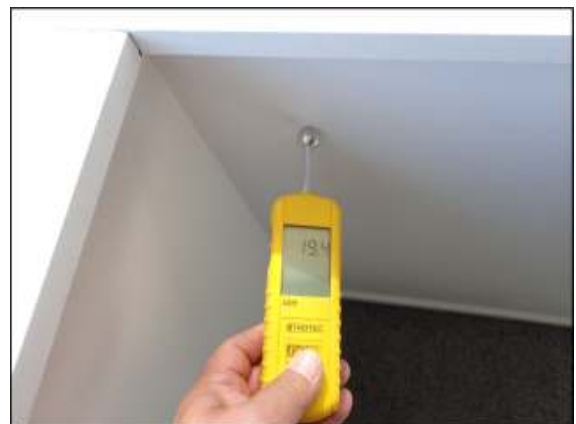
Normal level of moisture detected on wall facing exterior in family room. Optimal level shall be between 20 and 40.
